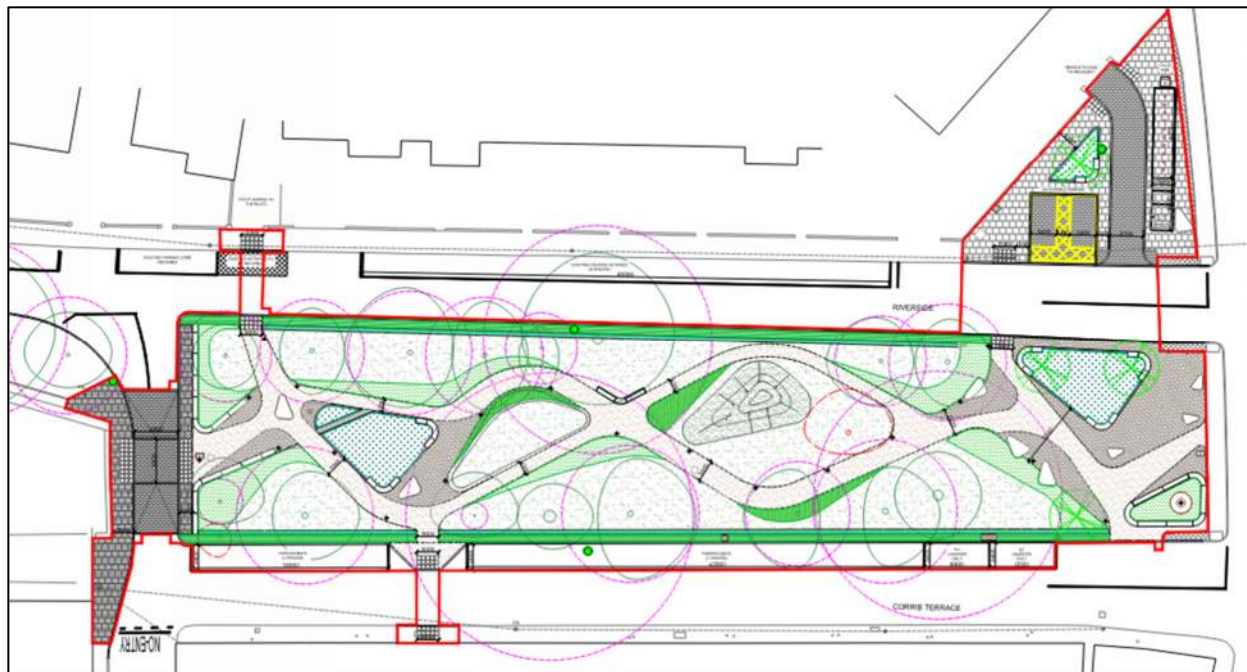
Proposed Site Layout (Ref: LUC Architects)
